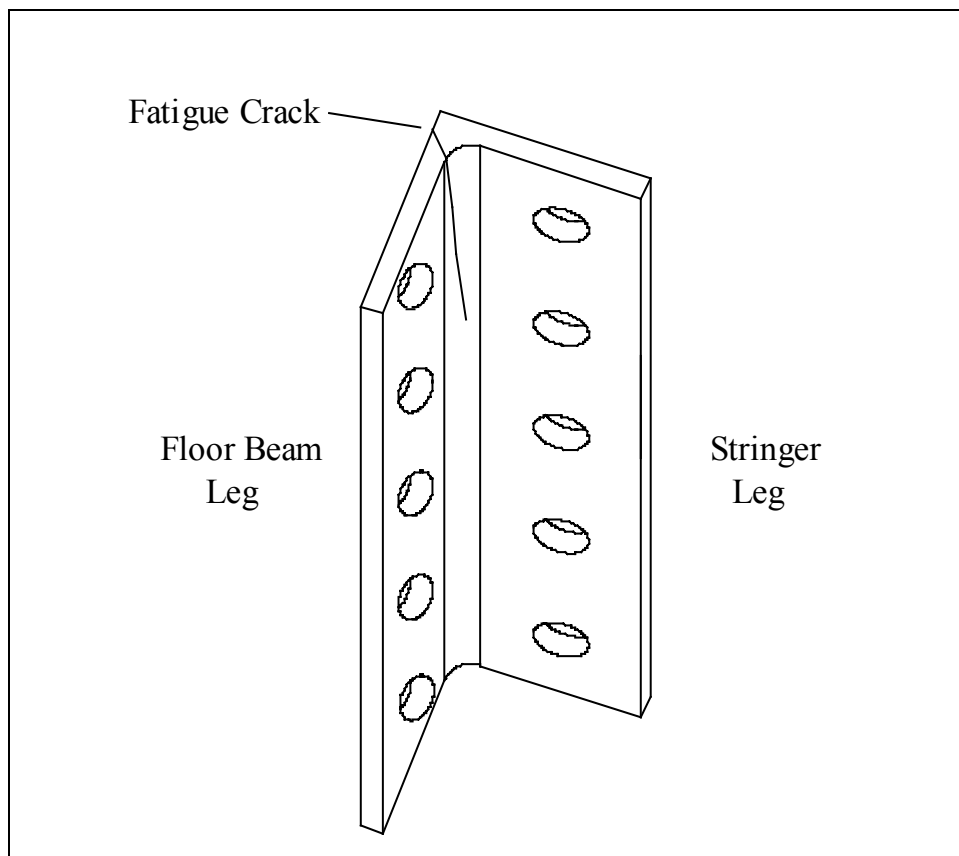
Clip angle with a typical fatigue crack
